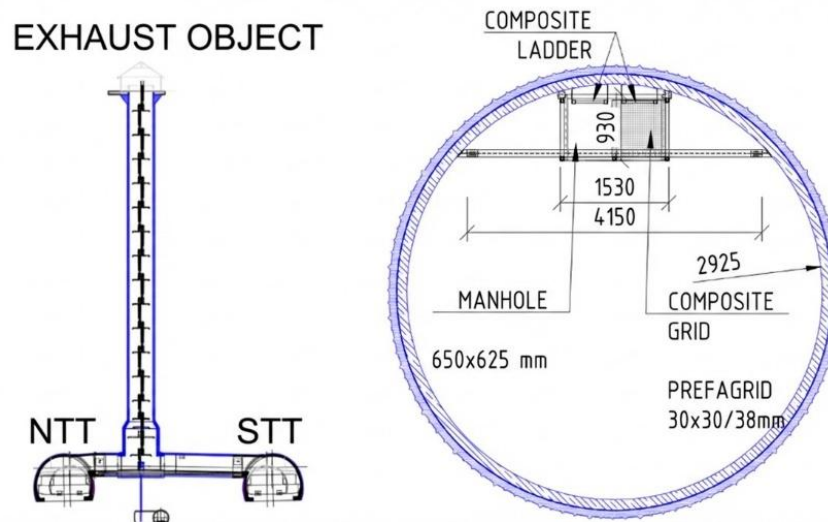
Left: cross-section of the tunnel and ventilation shaft; right: floor plan of the ventilation shaft
